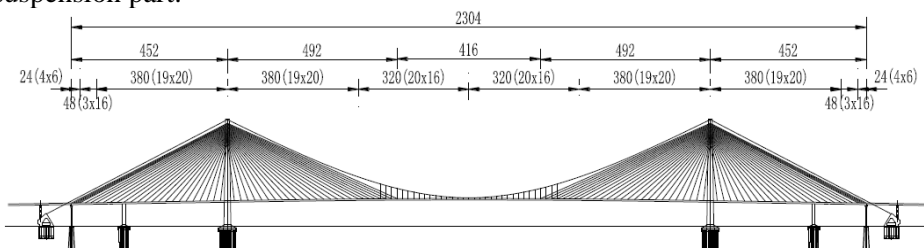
1400m cable-stayed-suspension bridge (unit: m)
